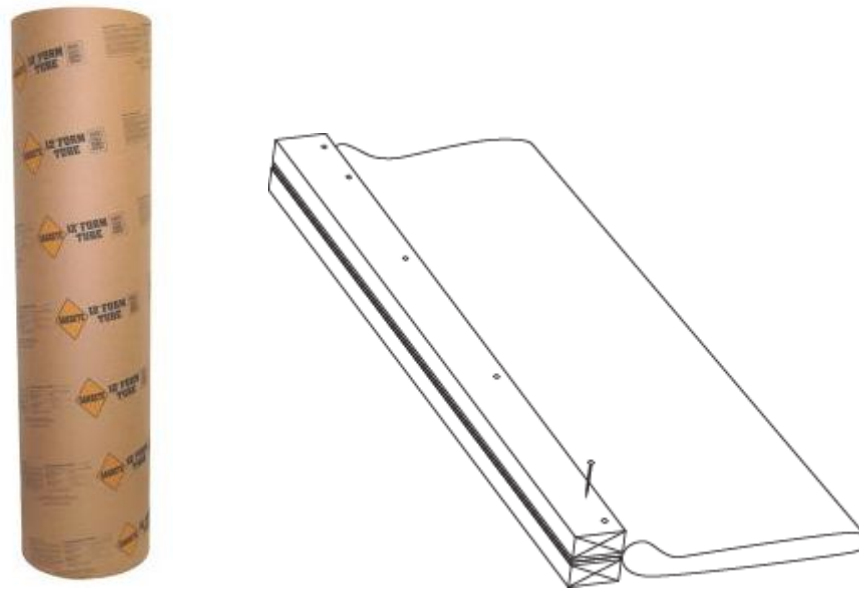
Cardboard tube mould (left) and Fast-Tube mould (Right) (Fab-Form Fabric-Formed Concrete)
